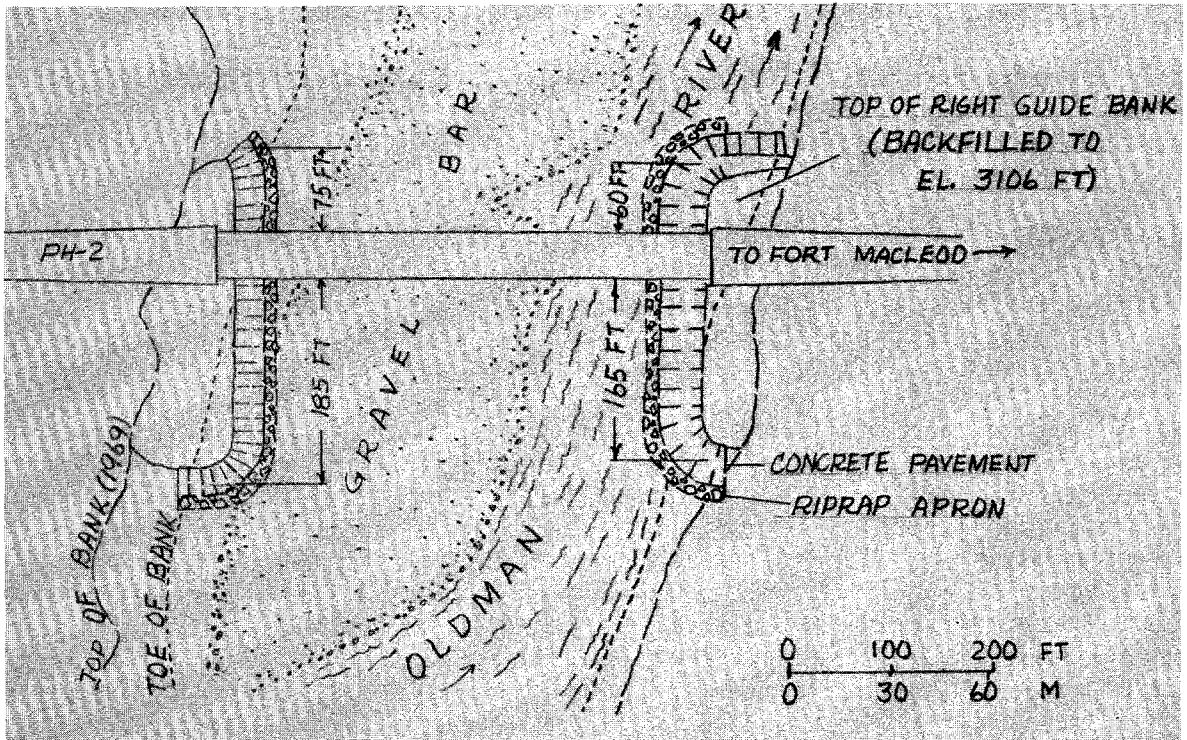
Plan sketch of PH-2 bridge and guide banks, Oldman River near Fort Macleod.
